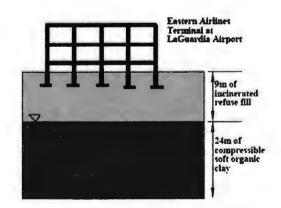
Schematic of U.S. Airways terminal constructed on shallow foundations bearing on highly compressible soil layers.
